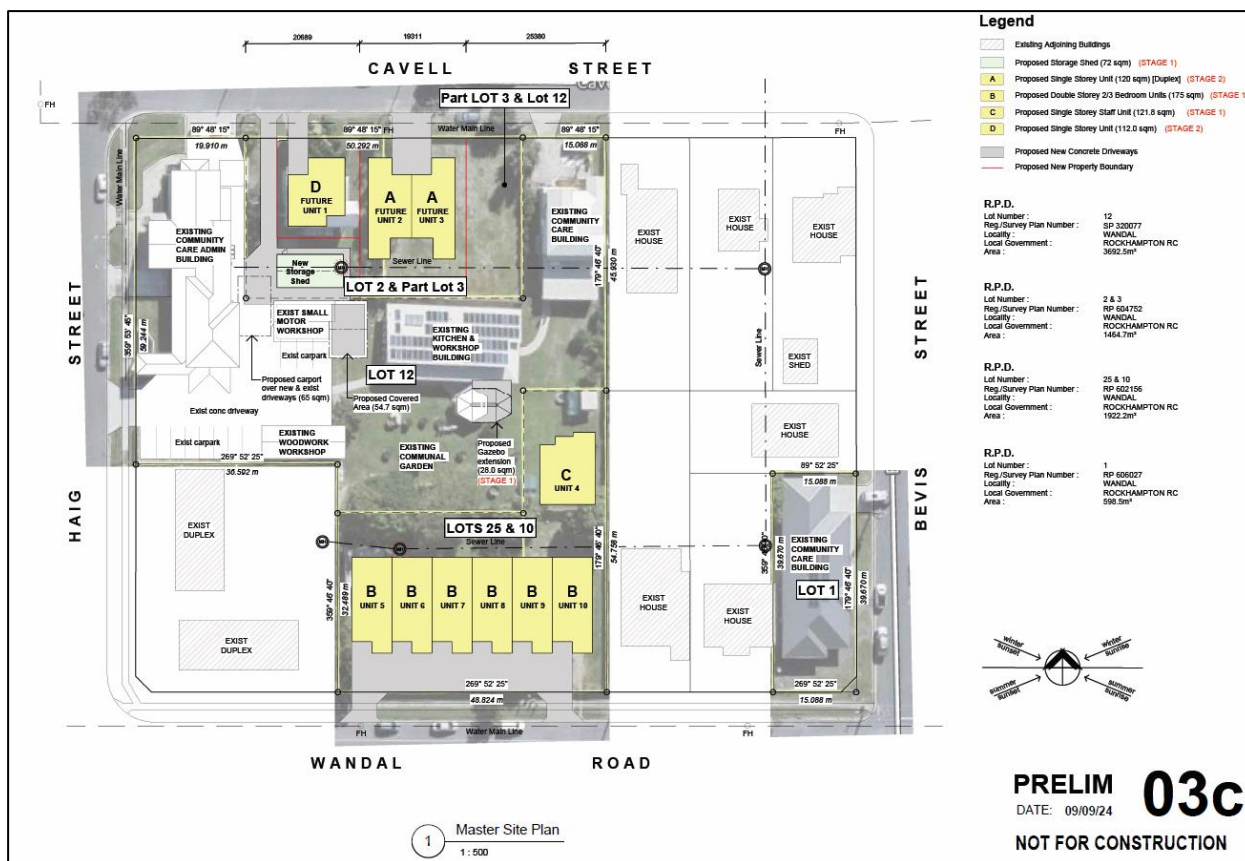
Proposed staging Plan (Rufus Design Group Plan; ref: 230704-01)
